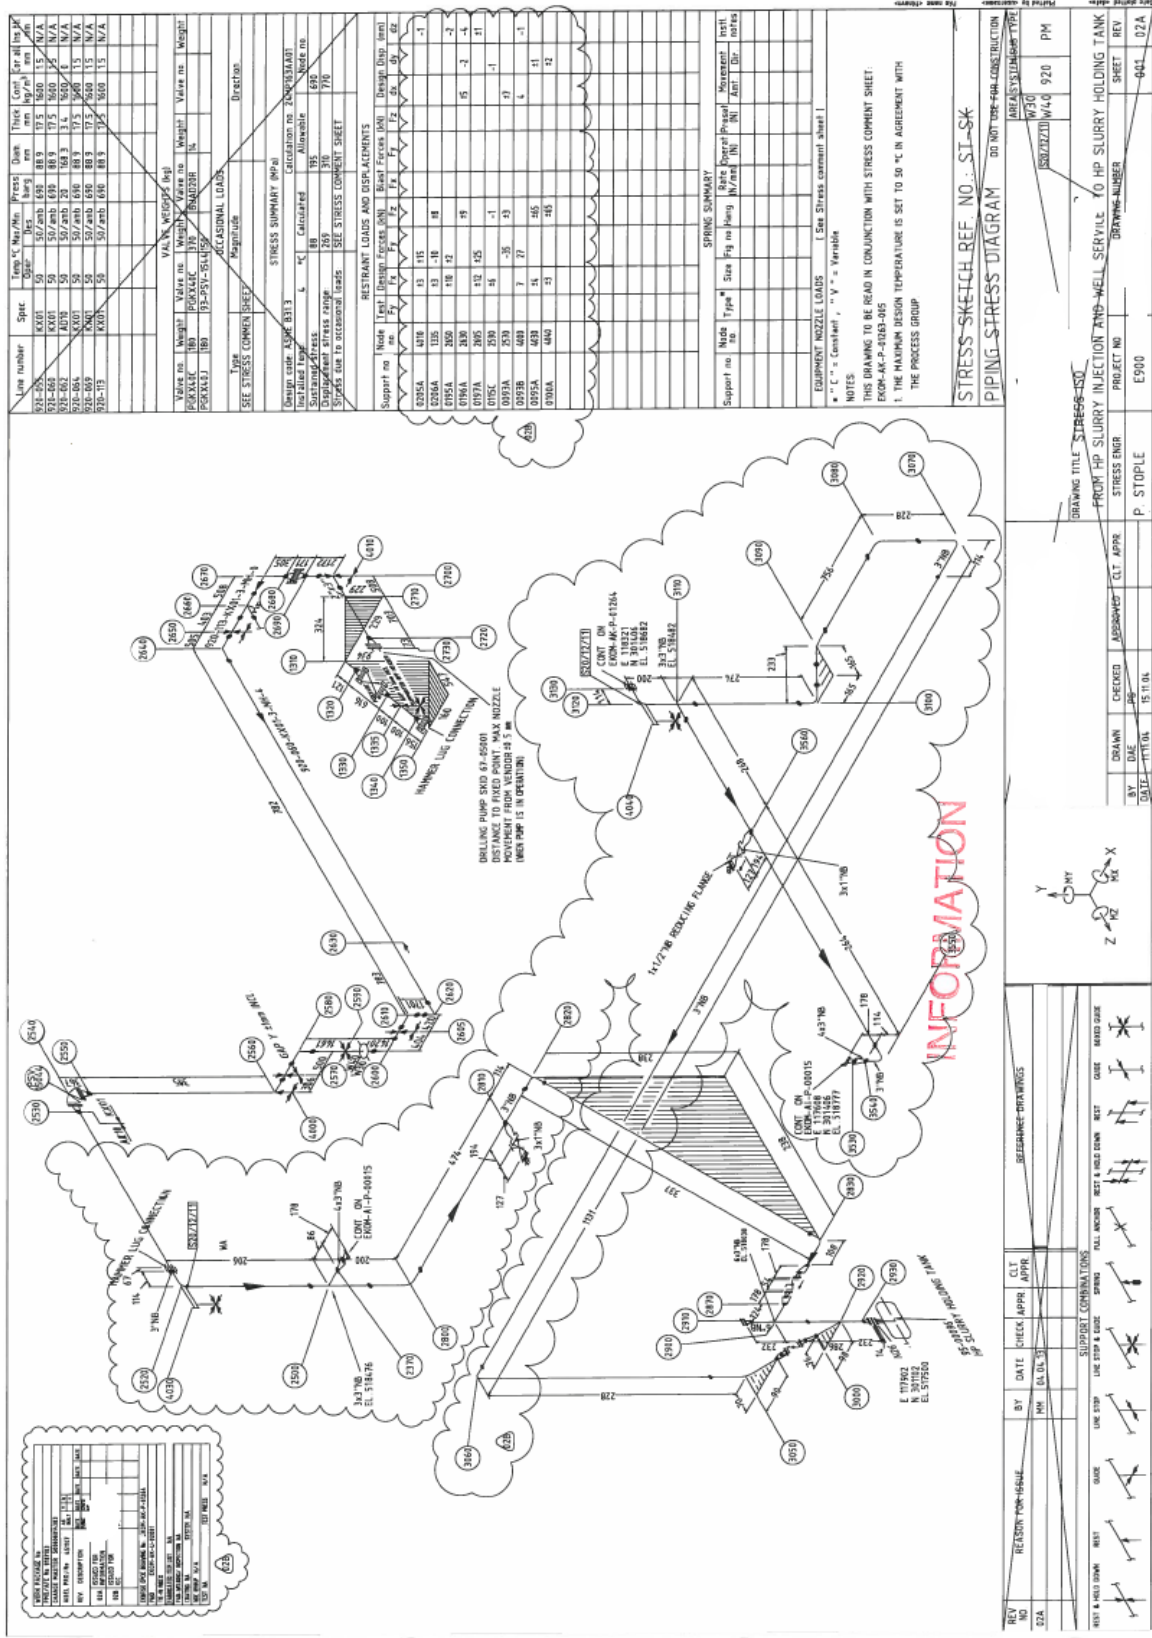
Pipe stress isometric drawing of the Slurry system in Mud Handling system sheet 2 of 6
